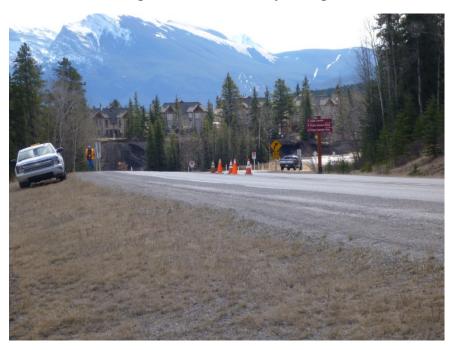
S012 sinkhole location (red arrow) with culvert to east of site in foreground. Photo taken facing northwest.
